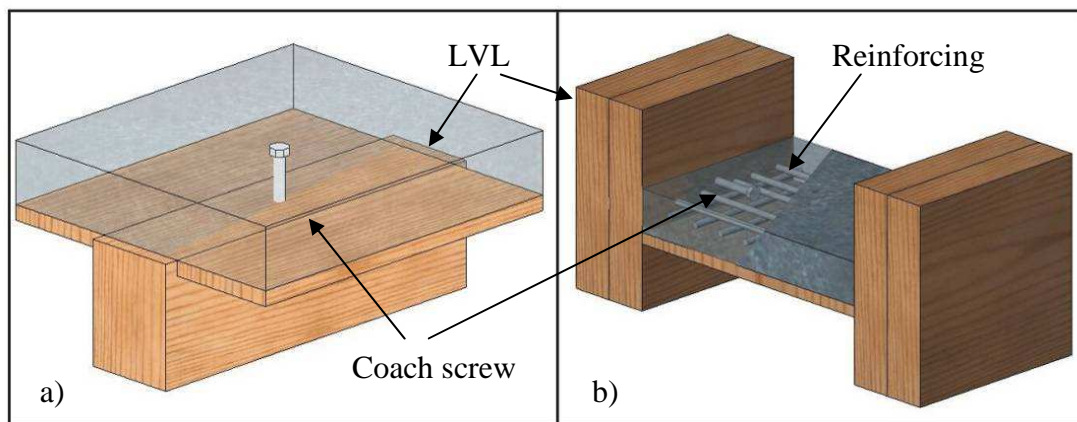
a) Siebold pushout specimen b) Test Specimen used
